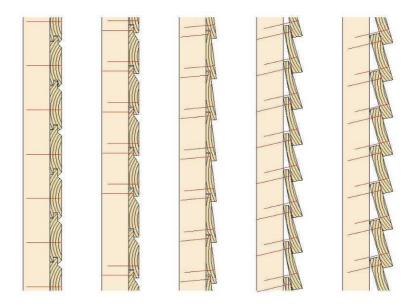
Typical profiles and fixings for horizontal closed jointed cladding
